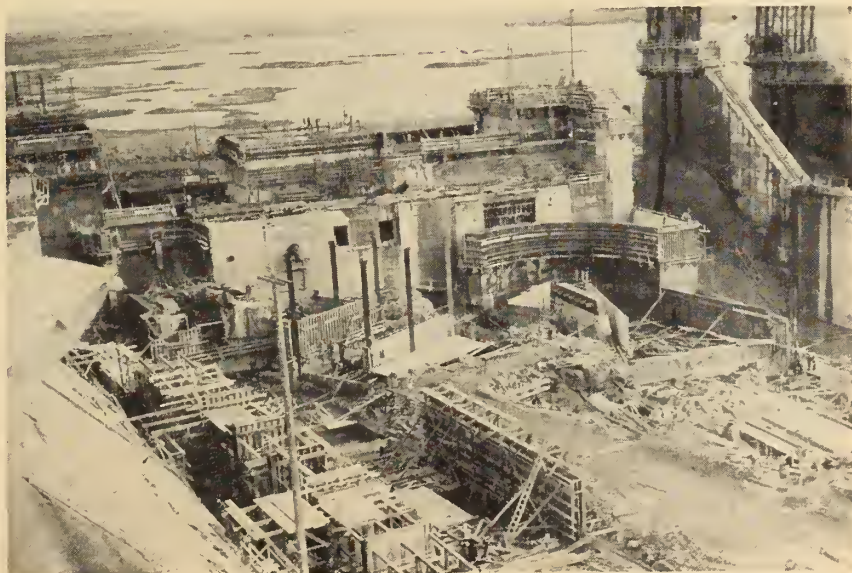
Washington shore Fishways under construction, McNary Dam.
